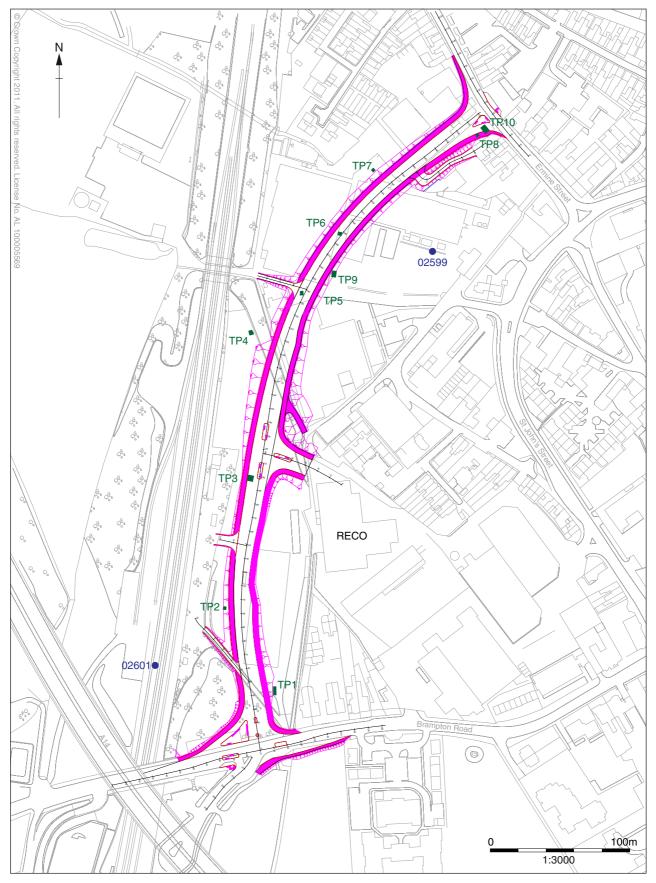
Proposed corridor (pink) showing location of Test Pits (green)
